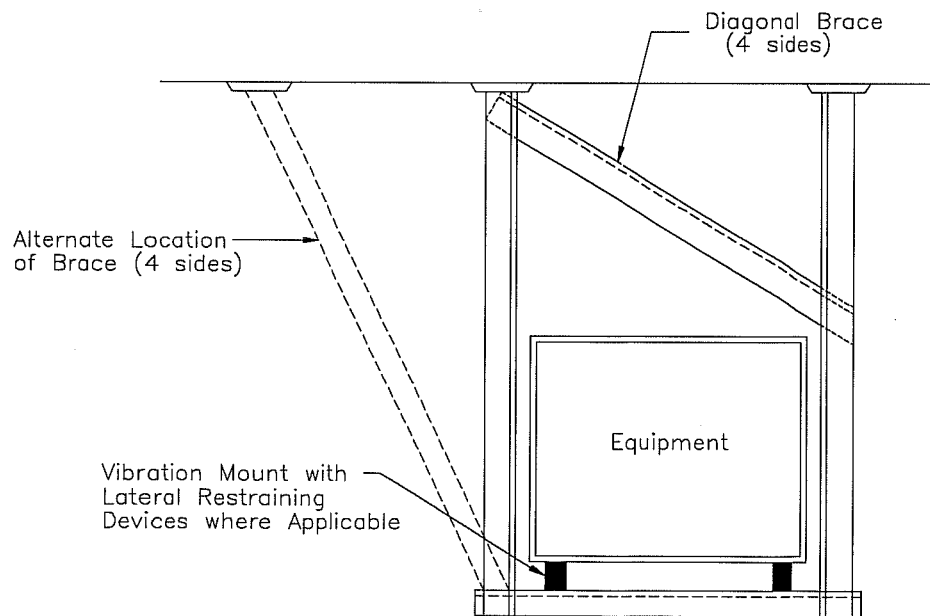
Bracing of Hung Equipment (Ref. 4)
